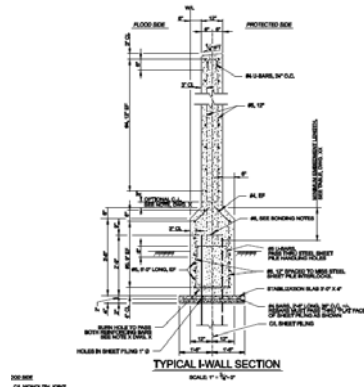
Typical cross section of I wall (adapted from USACE 2008)
